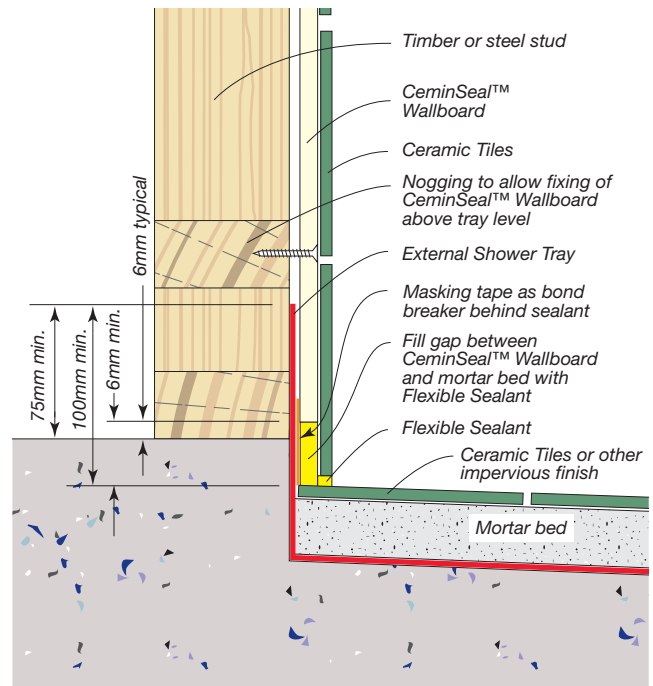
External Tray Shower Recess for Set-Down Concrete Slab
